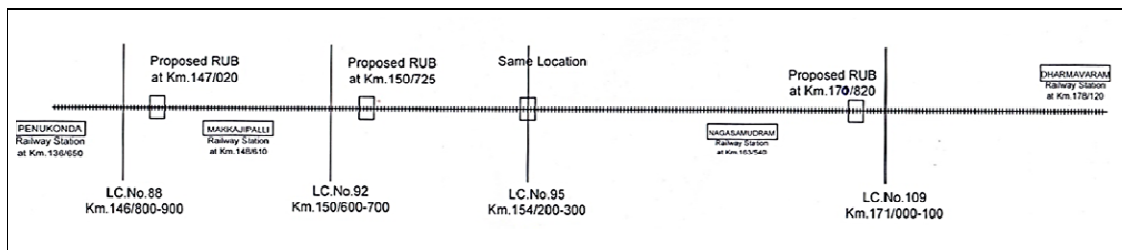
Plan showing location of proposed *RUB* constructions with reference to existing LCs at four stations
